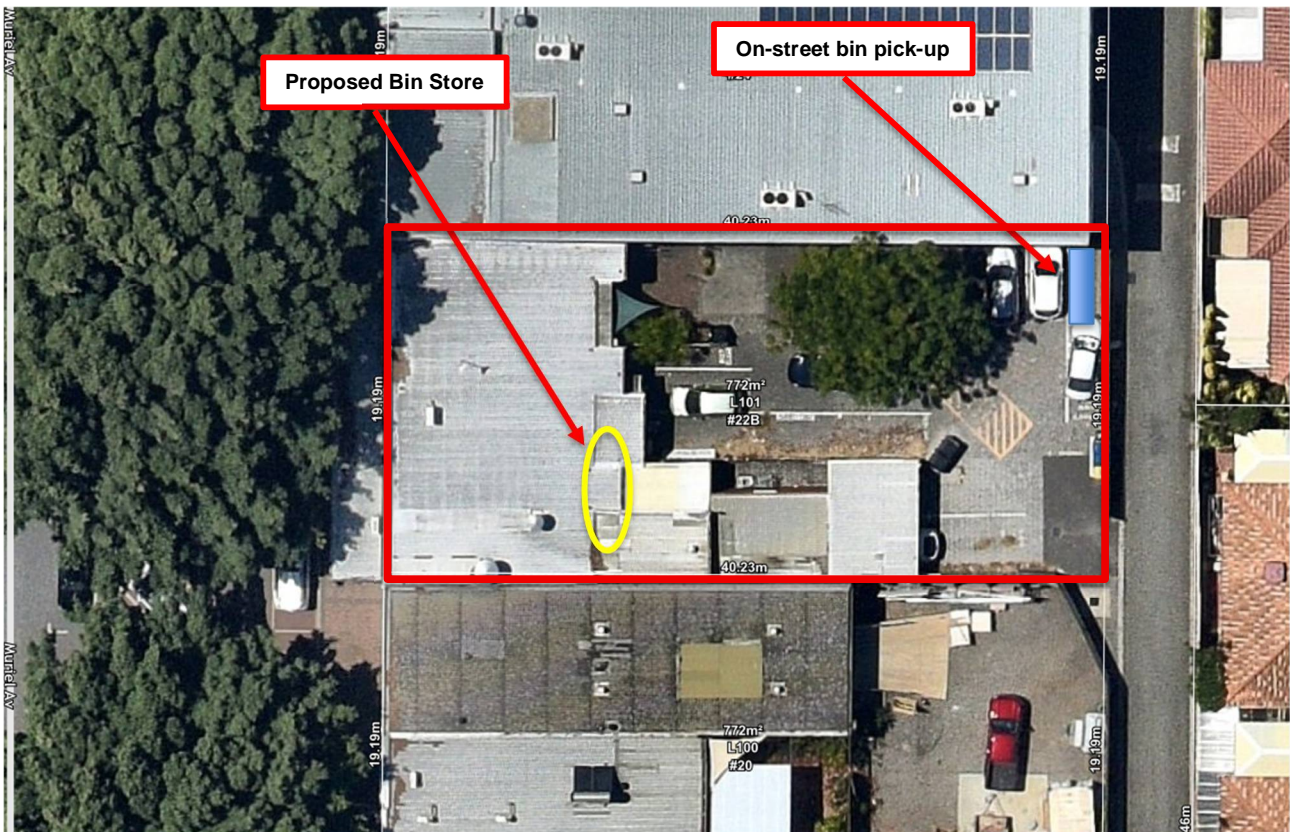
Aerial Site Plan. Location of the bin store on the Subject Land.
